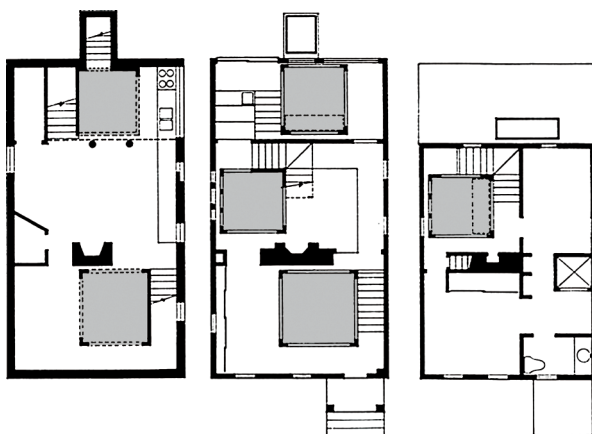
Moore House, New Haven, Charles Moore, 1967 (left) (Source: Authors' archive)
